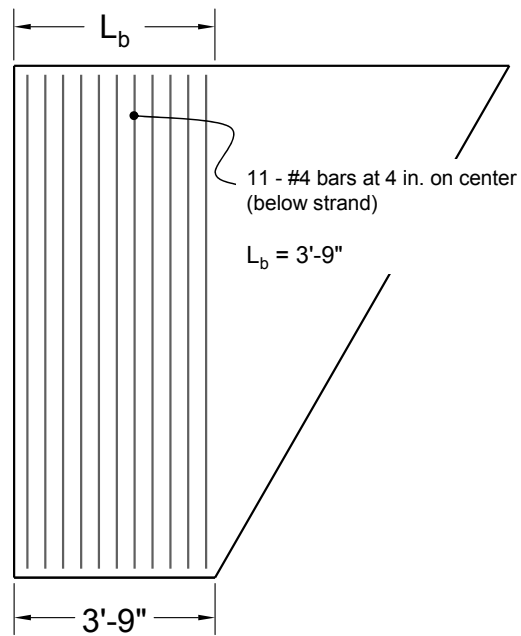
Layout of #4 Deformed Bars in PC Panel with 30° Skew
